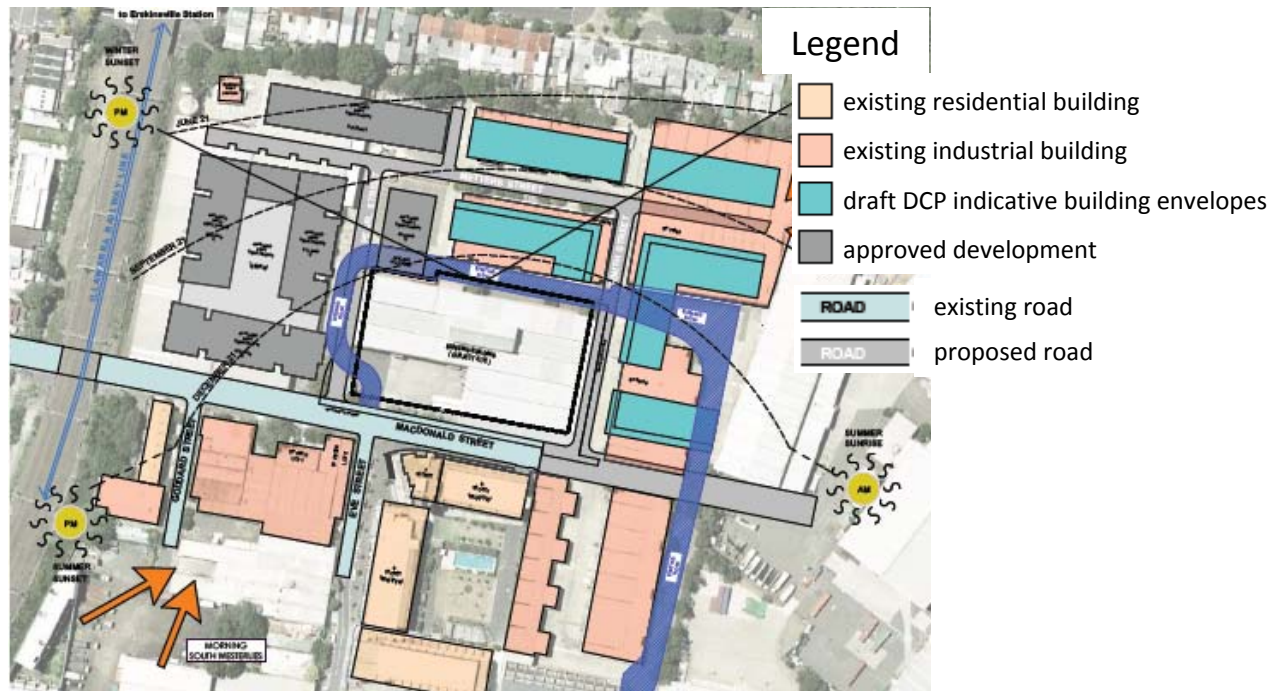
Site analysis plan showing the relationship of the subject site within its existing and planned context
